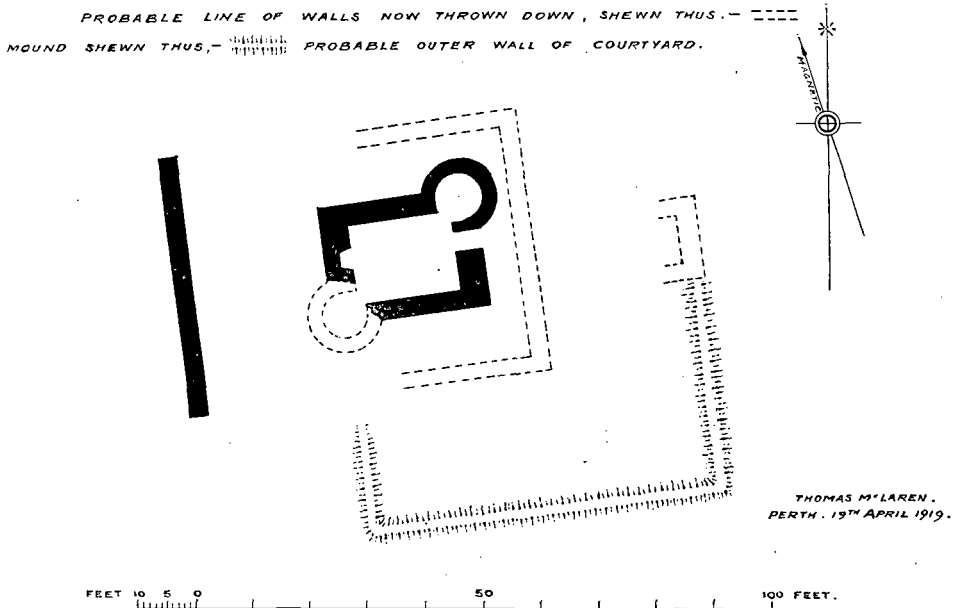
Plan of Rohallion Castle, Birnam Hill.
